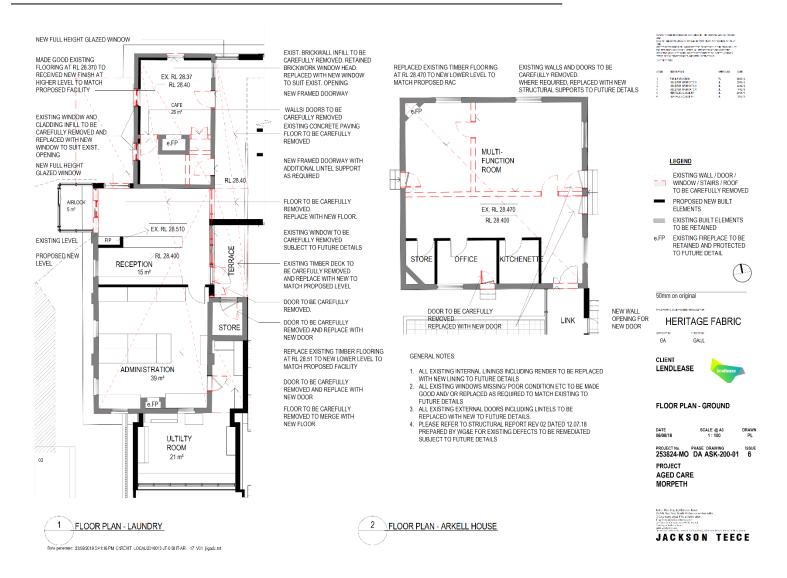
Proposed Floor Plan – Laundry and Arkell House Note: Laundry includes Gym/Chapel.
